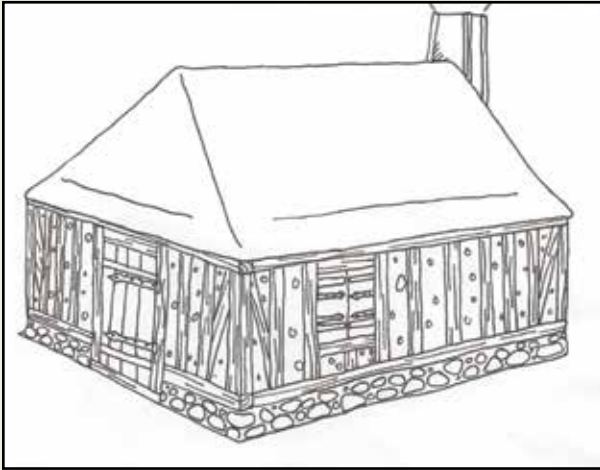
Artist's depiction of a *poteaux sur sole* structure at Fort St. Joseph.
